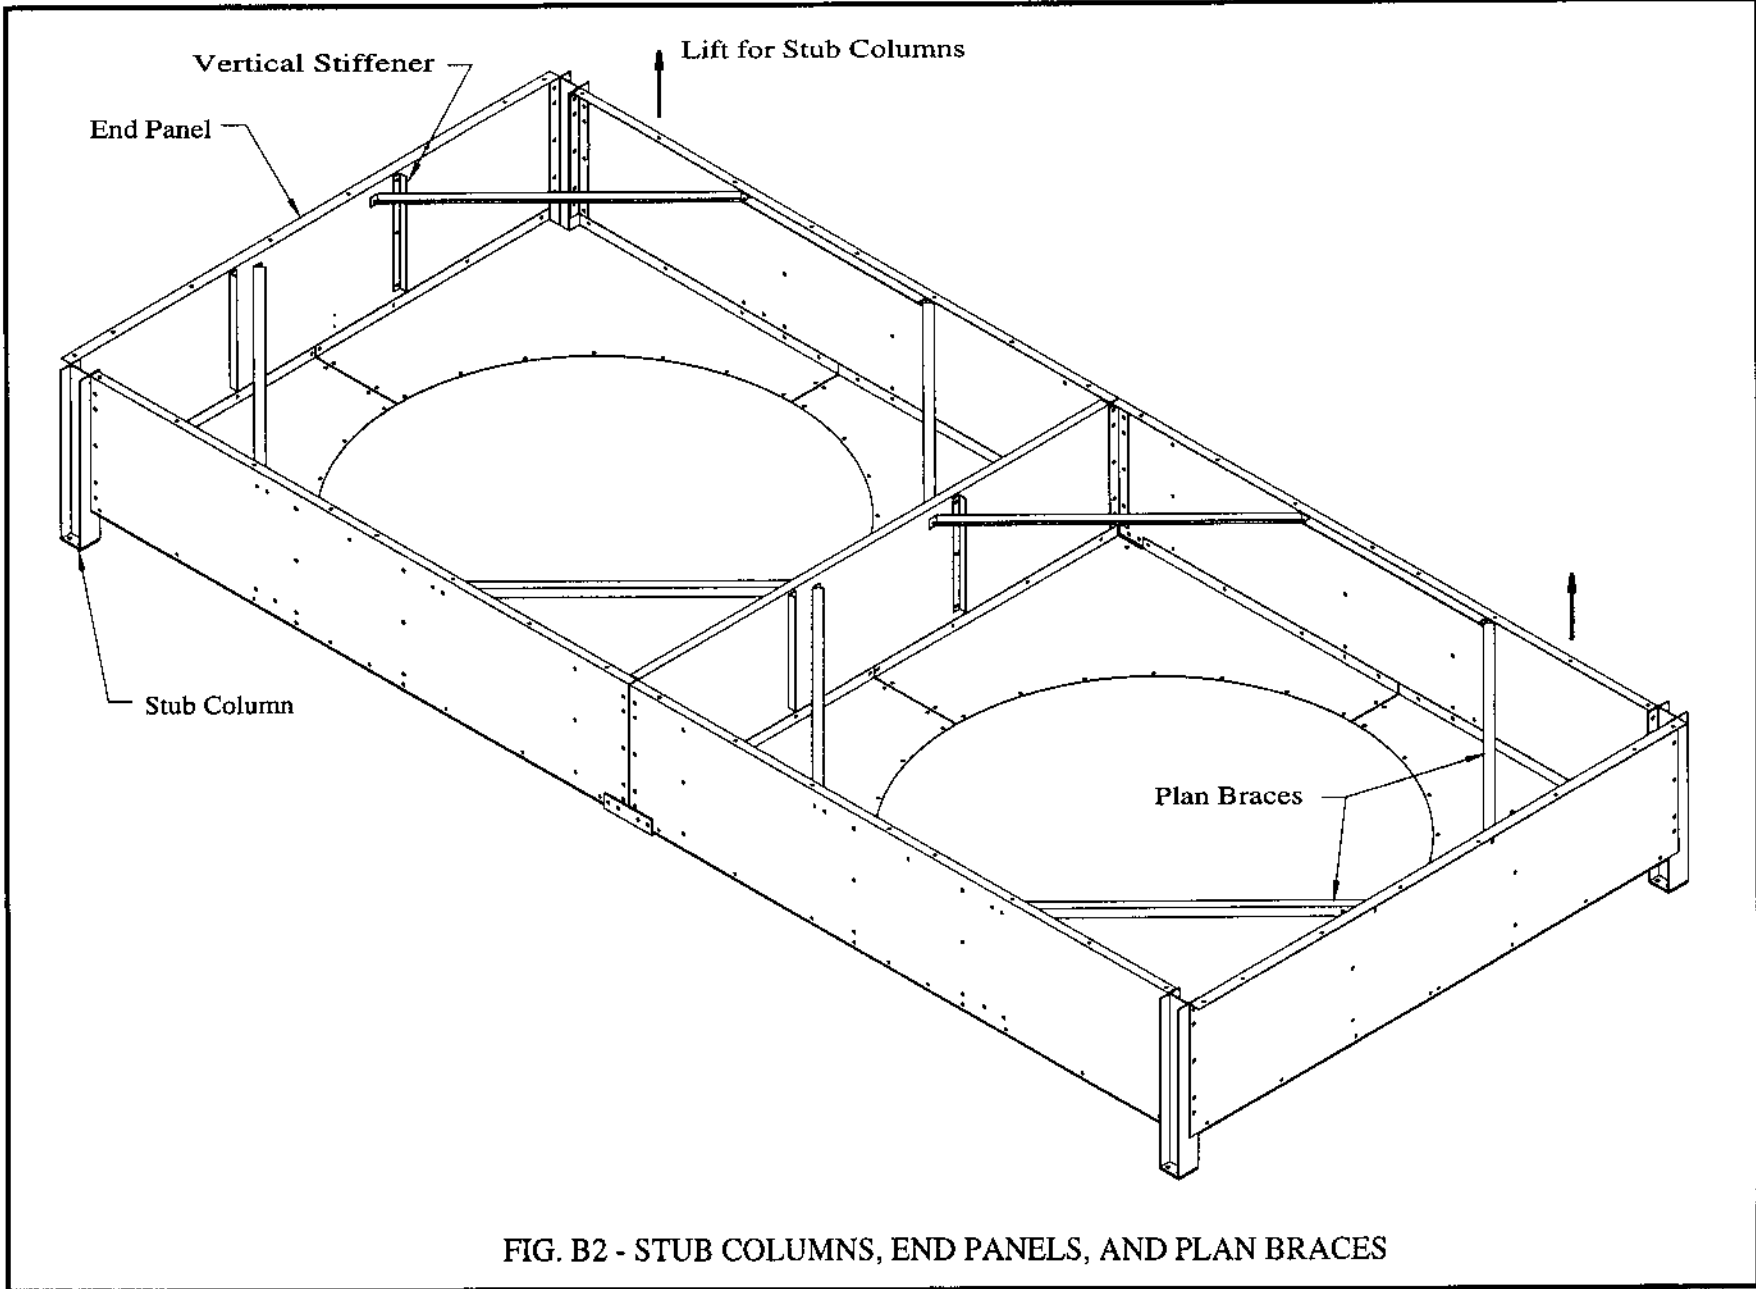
STUB COLUMNS, END PANELS, AND PLAN BRACES
